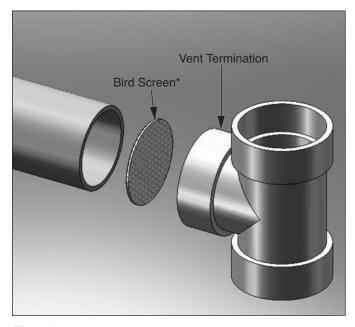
Horizontal Vent Bird Screen Installation with Tee Termination
